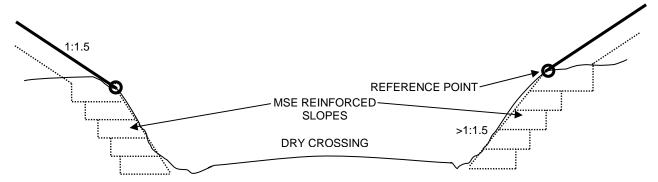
To minimize span for dry crossings, use reference points for slopes steeper than 1:1.5.
